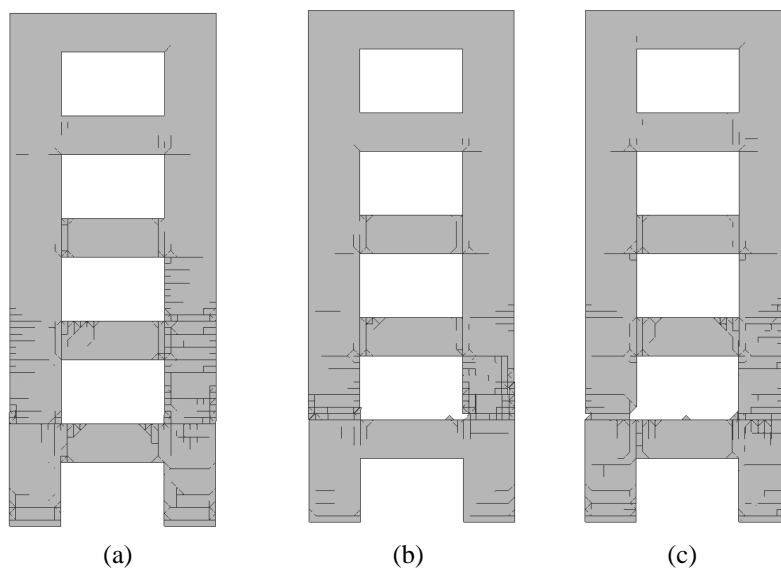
Crack pattern for the coupled RC wall structure exposed to the failure peak ground acceleration of earthquake: (a) Petrovac, (b) South Iceland, (c) Campano Lucano.
